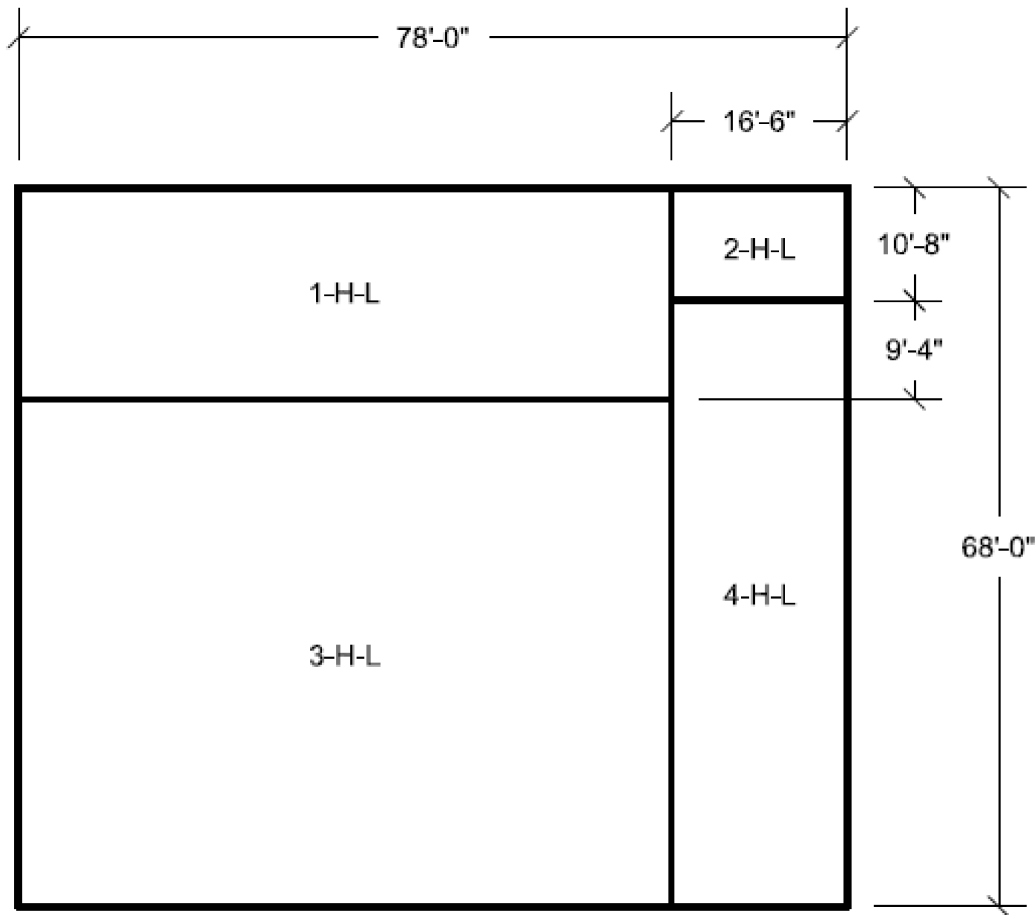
H.6-68 Pump House West Wall Looking East Horizontal Reinforcement Zones Far Side Face
